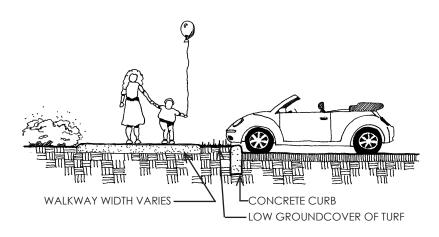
Parking Lot Curb - 6" Curb Adjacent Planted Area
